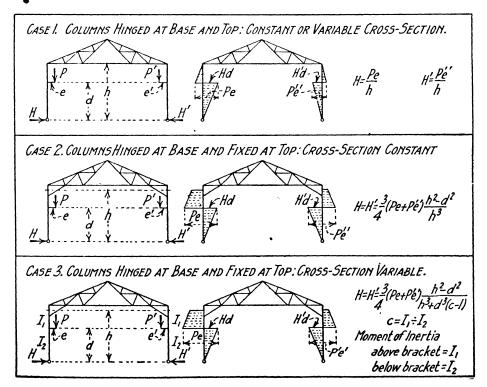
Stresses in Mill Building Columns Carrying Crane Loads.
